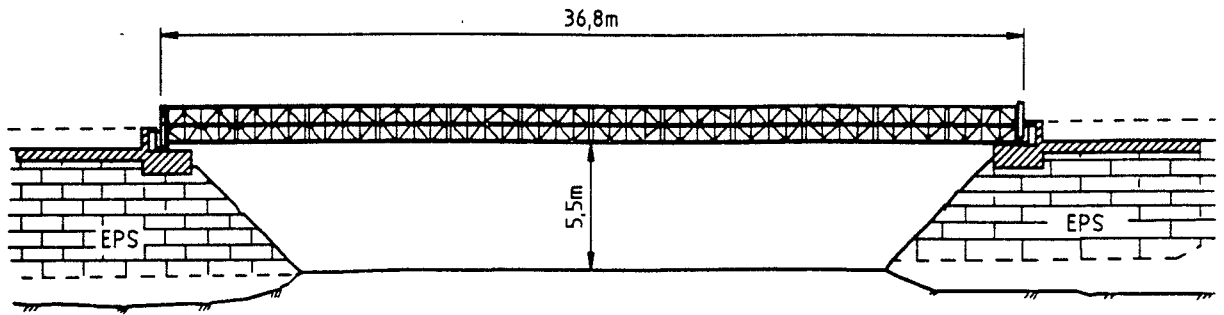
EPS as a support foundation for bridge abutments. E 6 Løkkeberg bridge , Norway (1989).
